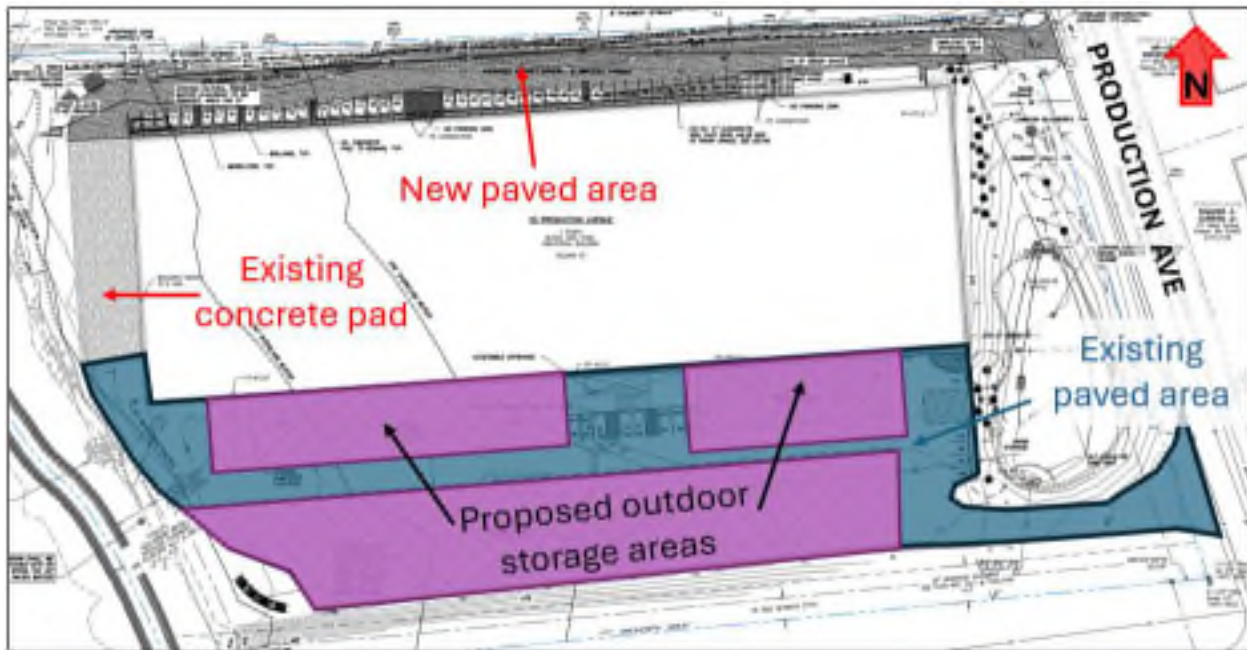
A snippet of the proposed conditions plan showing the new parking lot and outdoor storage areas.
